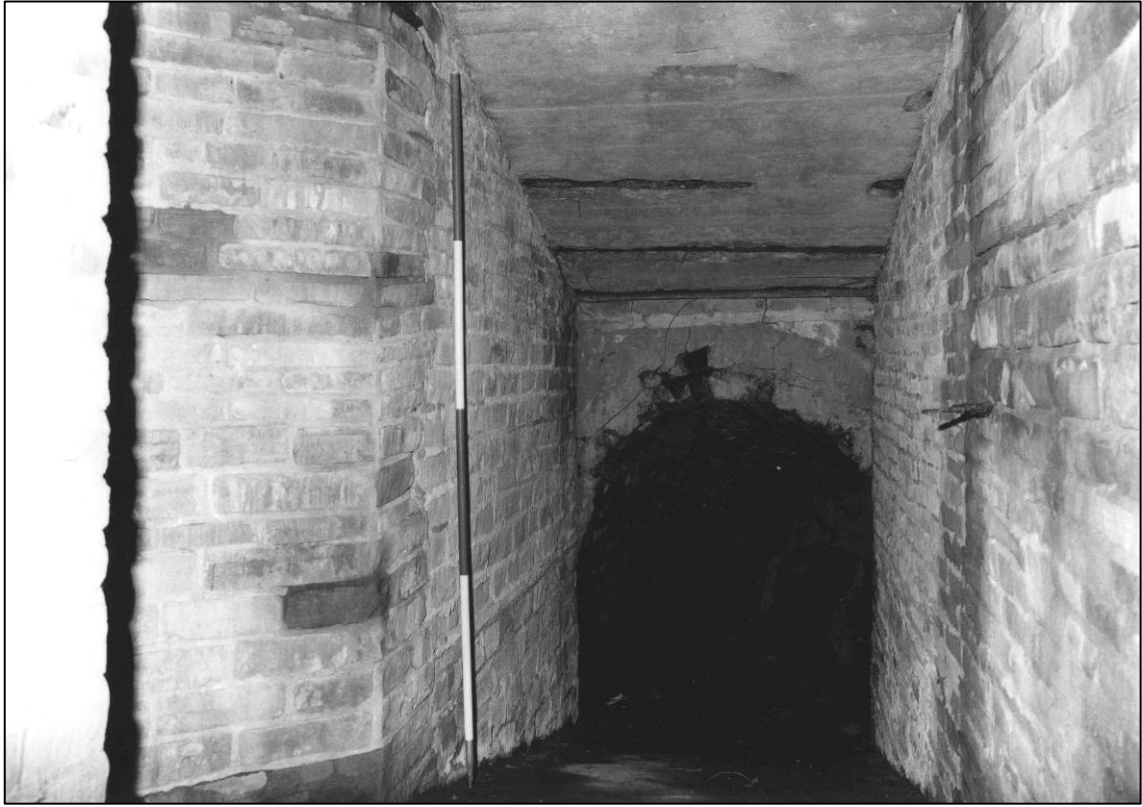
Building N4, fan passage to drift, looking W (photo 4/6).
